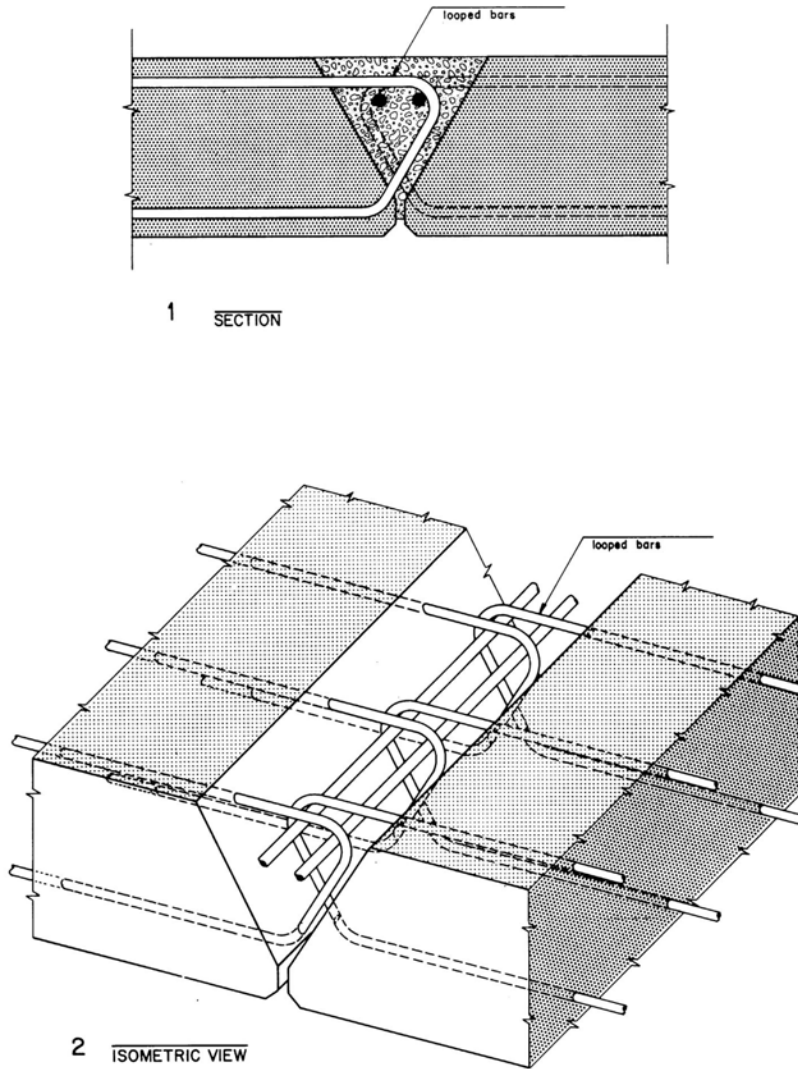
Floor unit to floor unit connection by looped bars (Ref 45)
